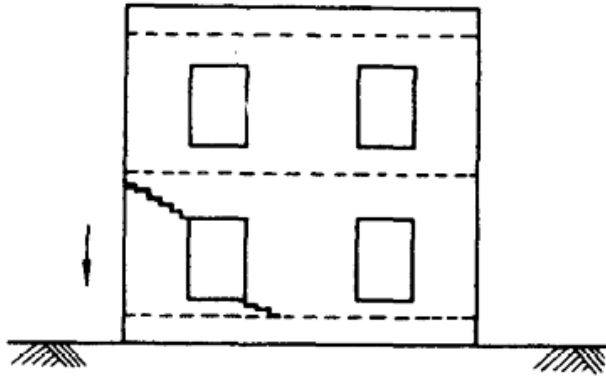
Cracks at the Corner of a Building Due to Foundation Settlement
